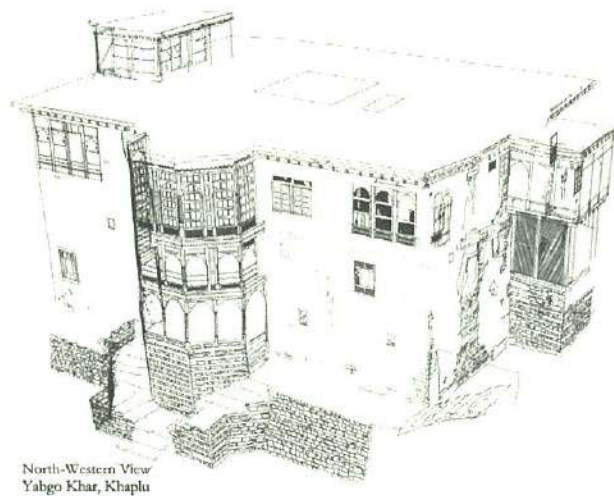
A complete 3D wire-frame model of Khaplu palace. Northwestern view of the palace shows the severe damage on western façade.
